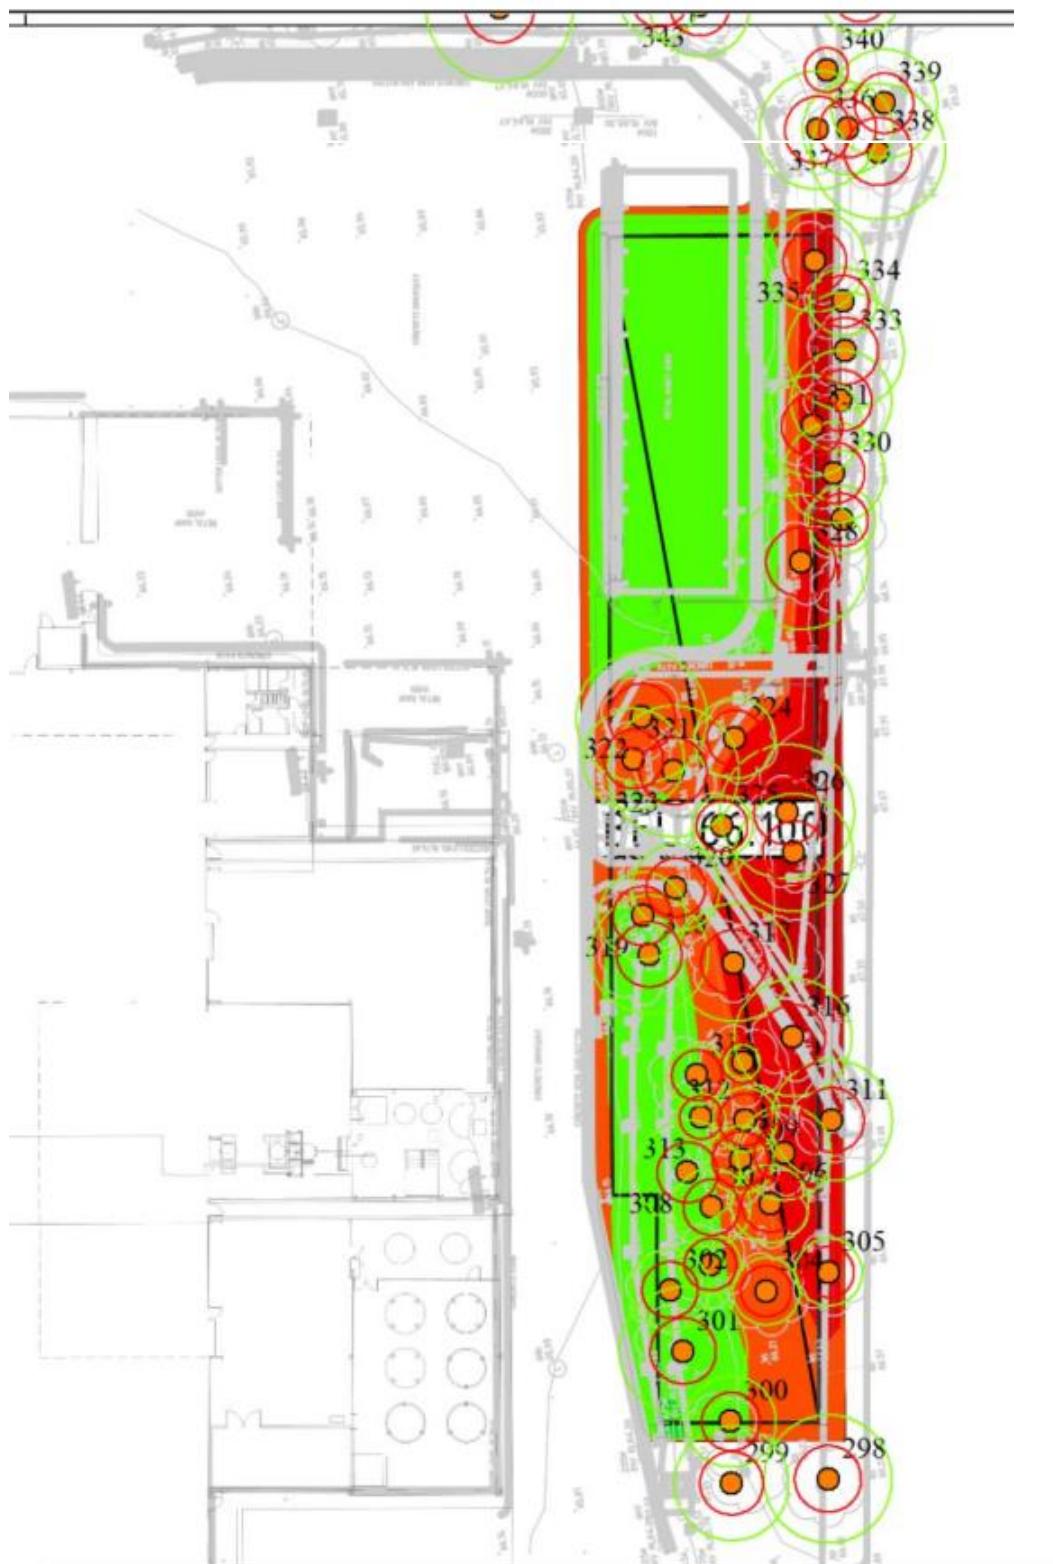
Tree locations overlaid on the cut & fill plan for the proposed building in the south-eastern corner of the development site.
